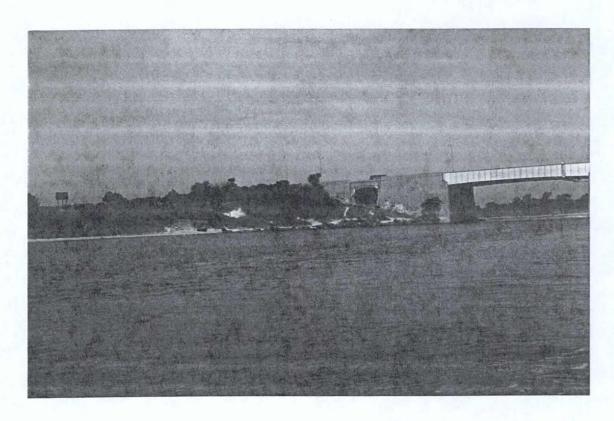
Gerritsen Inlet bridge, western abutment view from inlet toward south. Photo 4: Gerritsen Inlet bridge, western abutment view from bay toward west.
